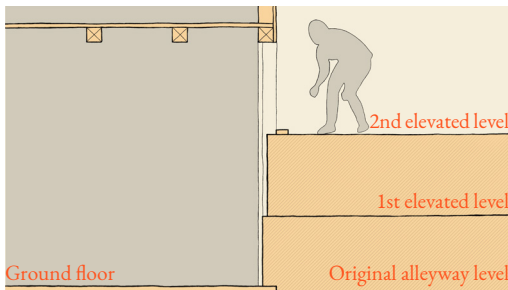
Analytical section showing how the house was affected by its elevated alleyway.
